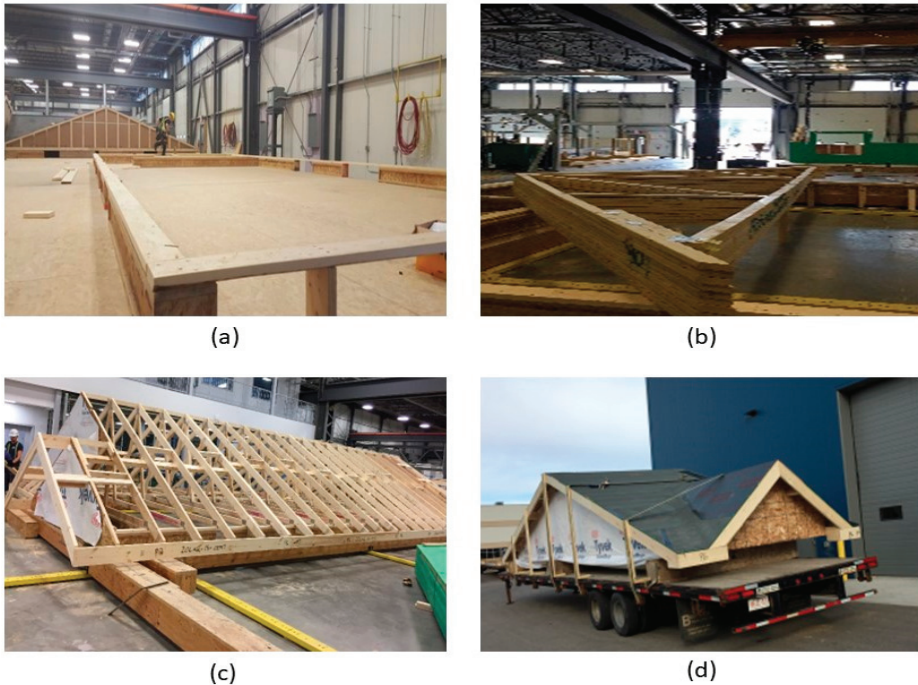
Roof production (a) setup jig, (b) unloaded truss, (c) attaching roof components, and (d) small roof module on the transportation trailer (courtesy of ACQBUILT Inc., Edmonton, AB, Canada) [6].
